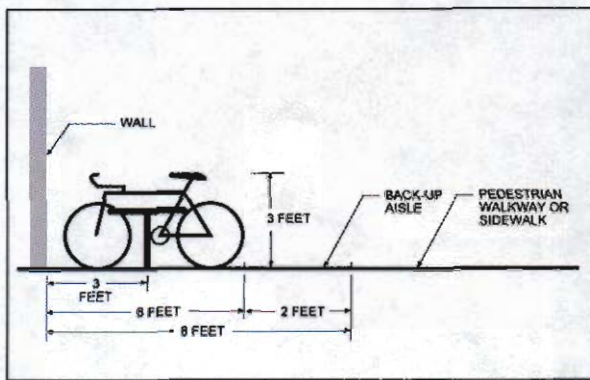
Elevation showing separation between bicycle parking and pedestrian walkways
